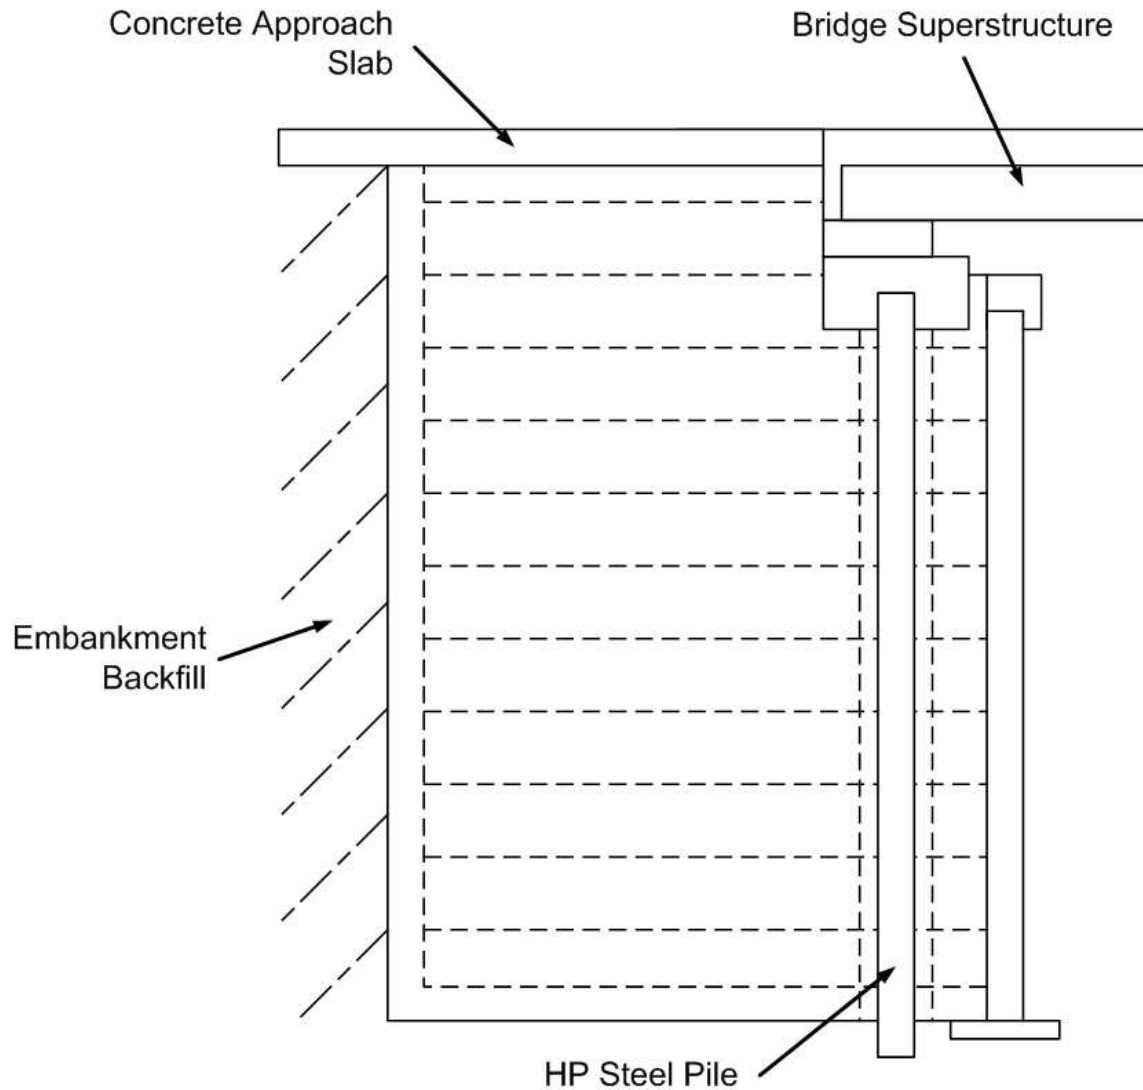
Section View of Less Common Abutment Types (Mechanically Stabilized Earth)
